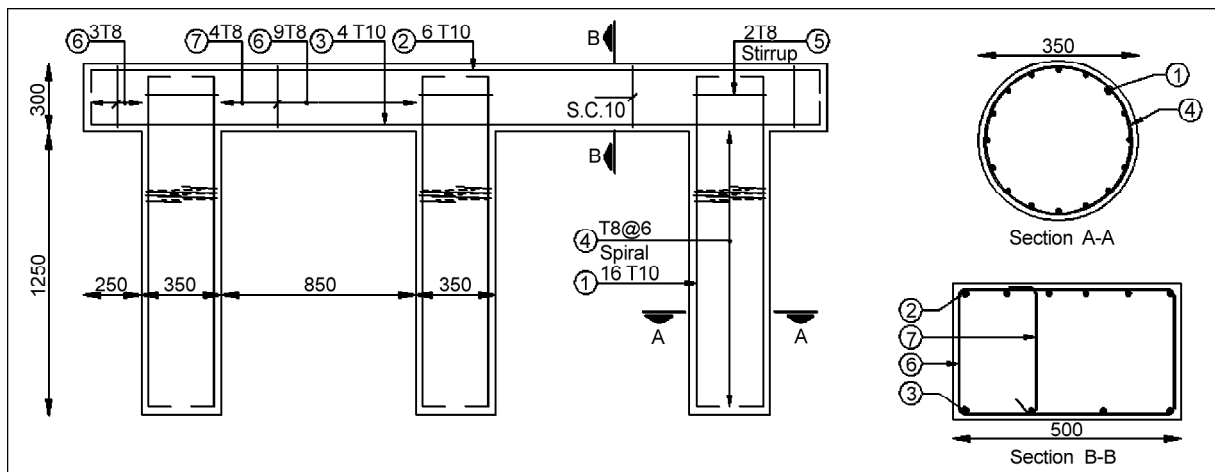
shows the schematic of the test specimen and the reinforcement details. Because of
